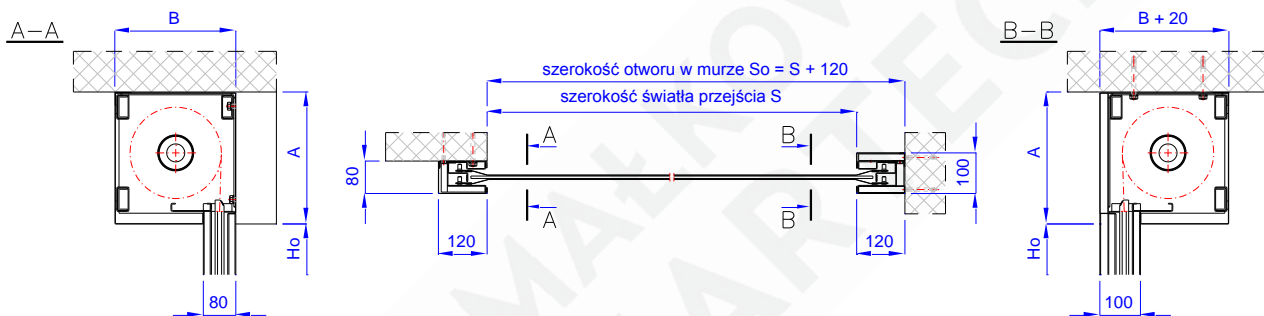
Type MARC-Ok(st) EI60 fire protection window curtain
